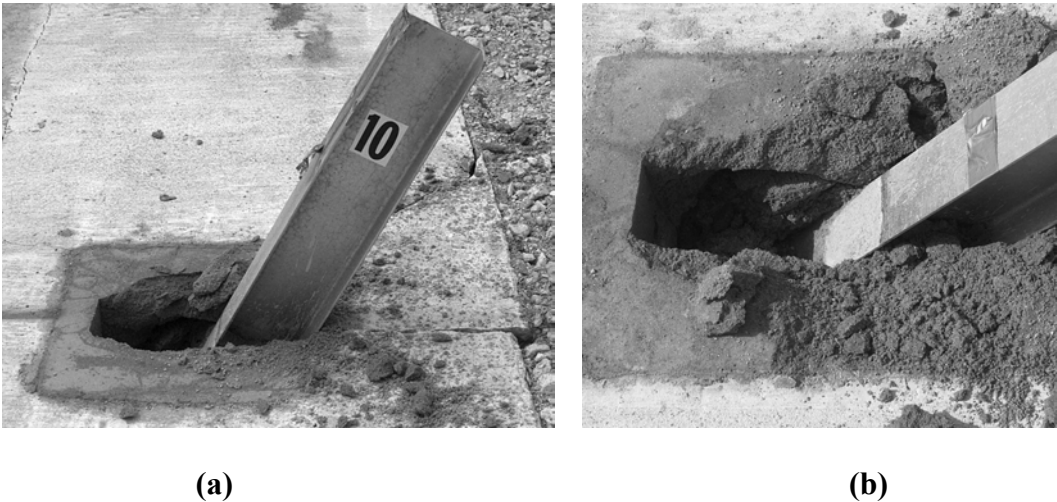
Steel Posts in Concrete Mow Strip with Grout-Filled Leave-out: (a) Square Leave-out; (b) Rectangular Leave-out.
